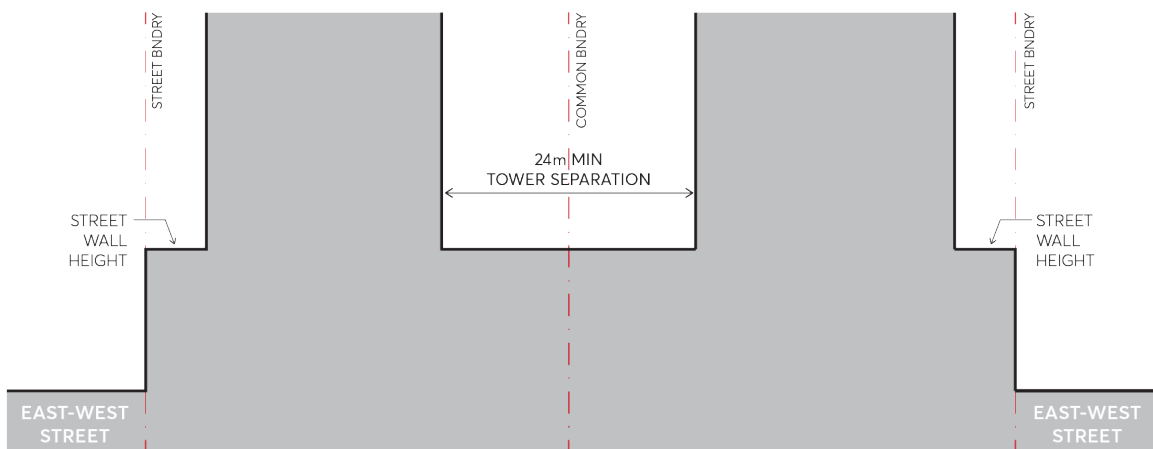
Tower separation between primarily north-south facing facades
